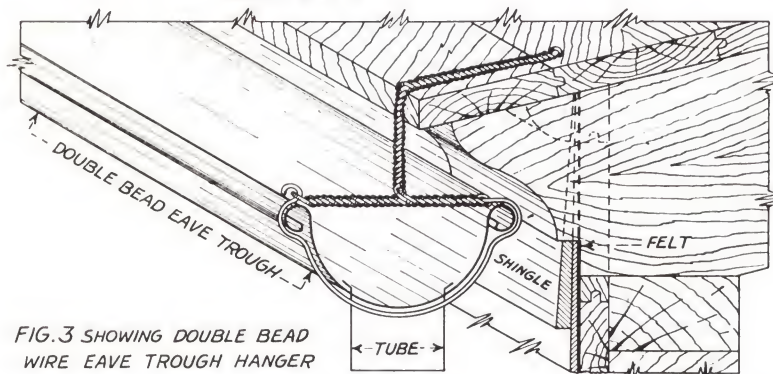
SHOWING DOUBLE BEAD WIRE EAVE TROUGH HANGER
